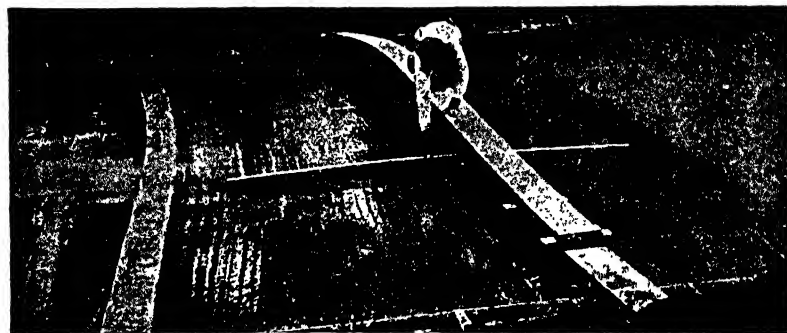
,828.—Finishing concrete pavements 14. Use of straightedge important detail.
